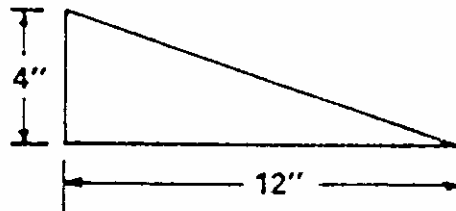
Roof having a slope of not less than 4 in. in 12 in.
